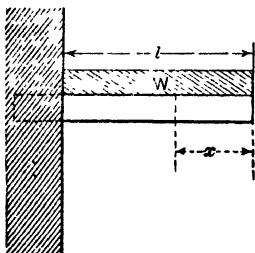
Cantilever Beam. Uniformly Distributed Load
